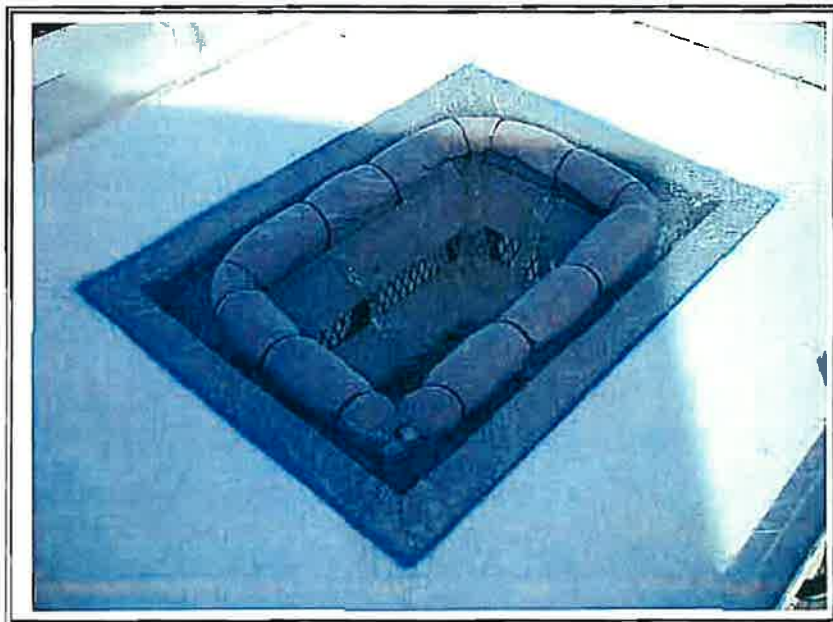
Blue RTV Silicon placed around edge of Skimmer Box
